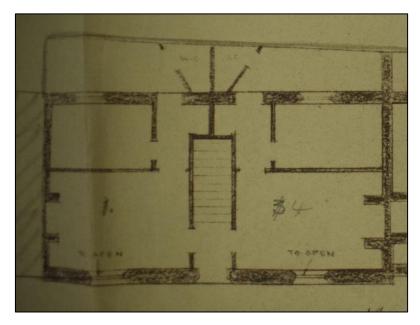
Probable original ground floor layout (No. 1 Magdalene Lane) (SWHT Ref. D/B/ta/24/1/79/1648)
